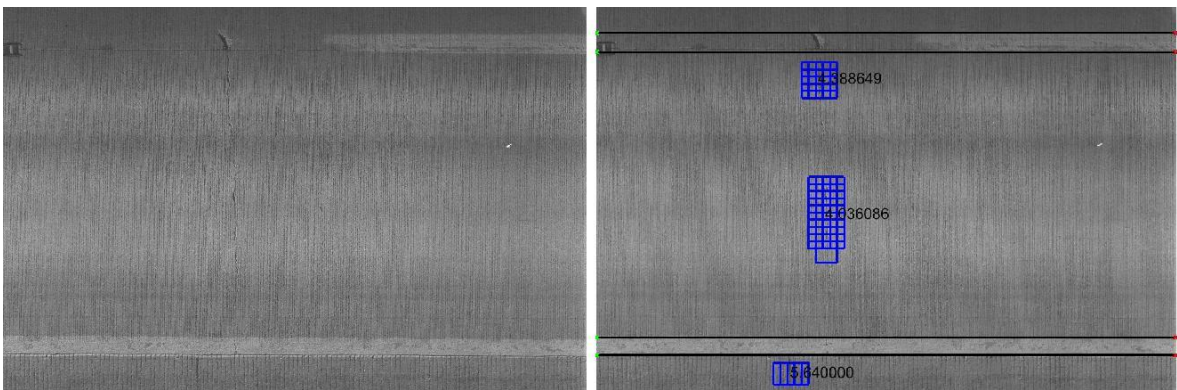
Example of computing crack width at medium severity: raw crack (left) and crack detection (right)
